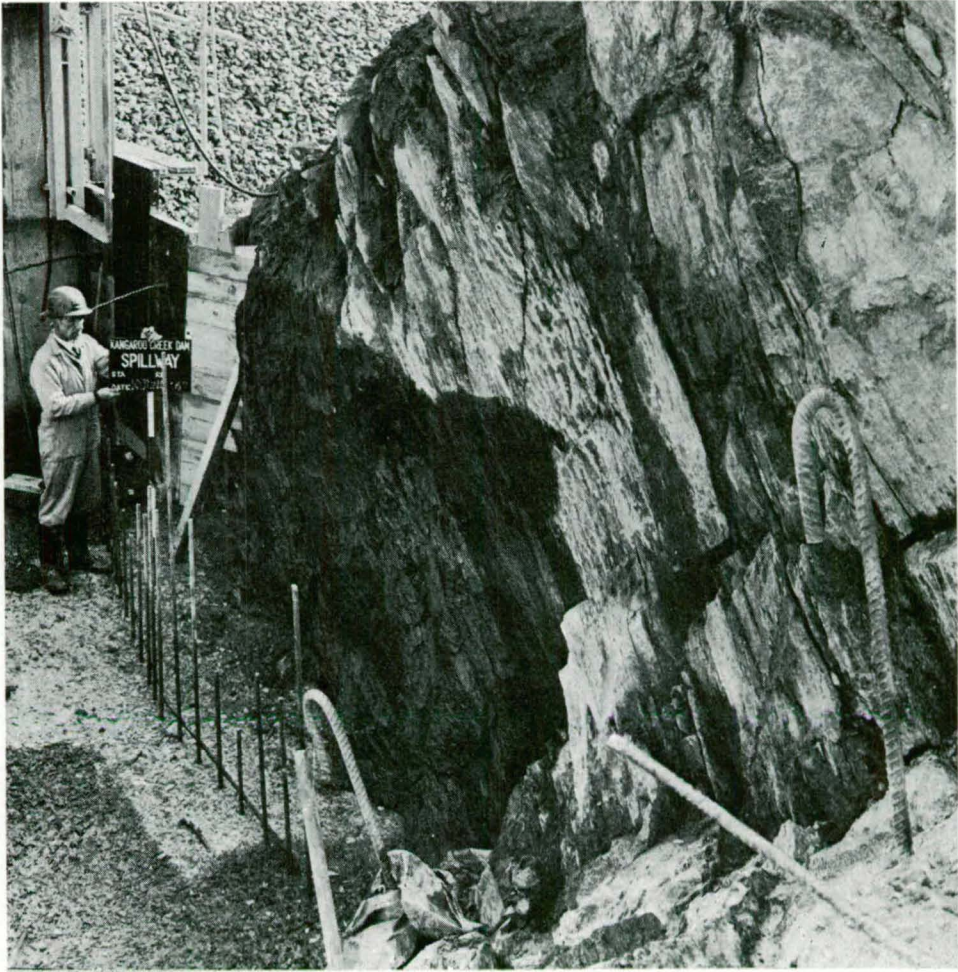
Vertical batter of final excavation for spillway block E. The surface of the disturbed rock has been bitumen coated to eliminate bonding between rock and concrete.
